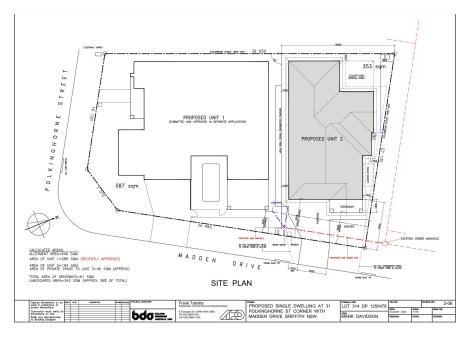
Proposed Site Plan, showing location of the proposed dwelling and previously approved dwelling (via DA 138/2022).
